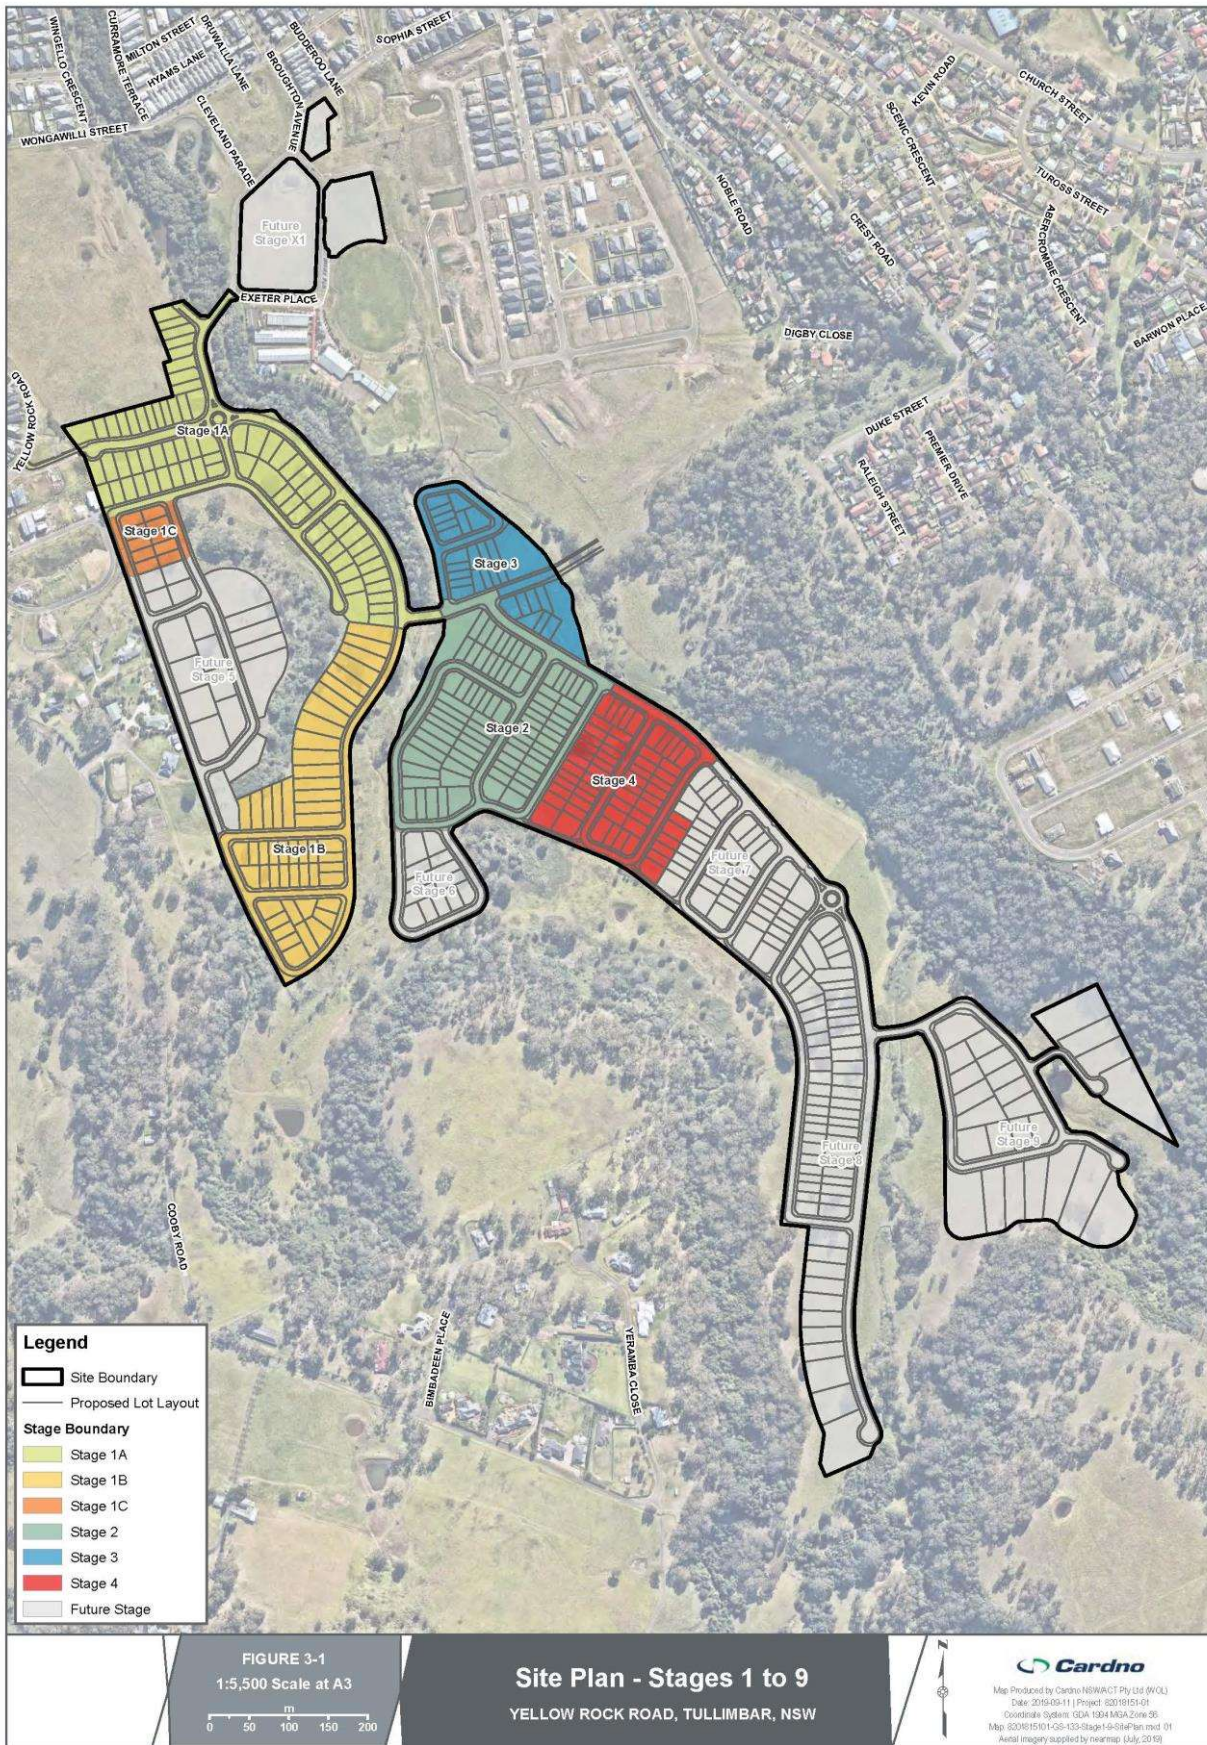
1881 Tullimbar Lot Layout, Staging and Site Plan
